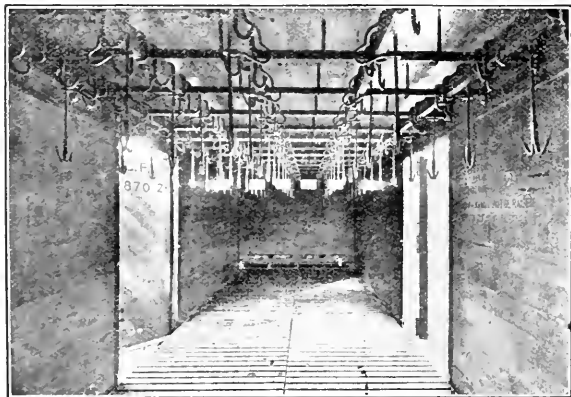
MEAT RACK AND HOOK INSTALLATION
